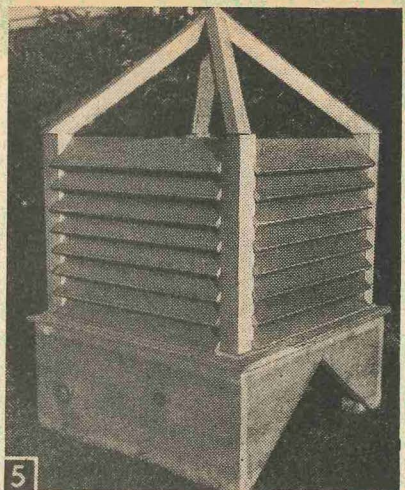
and 5 with the rafters extending ½ in. beyond the posts. Nail the ¾ x 1 in. furring strips (Fig. 3) in place and bevel the top outer corner to same angle as rafters.
